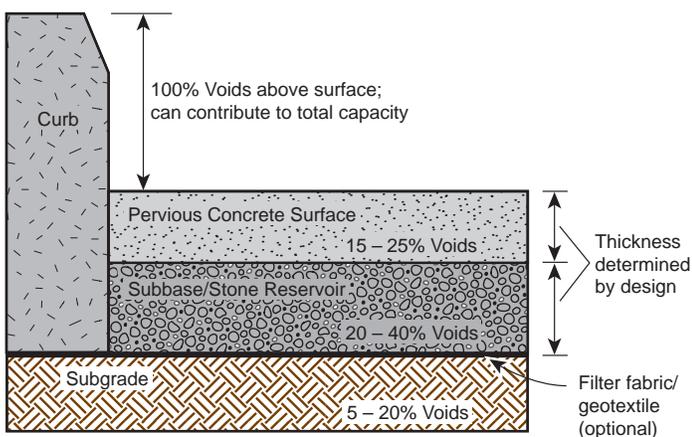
Typical cross-section of pervious concrete pavement. On level subgrades, stormwater storage is provided in the pervious concrete surface layer (15% to 25% voids), the subbase (20% to 40% voids), and above the surface to the height of the curb (100% voids). After: ACI 552R-06.
